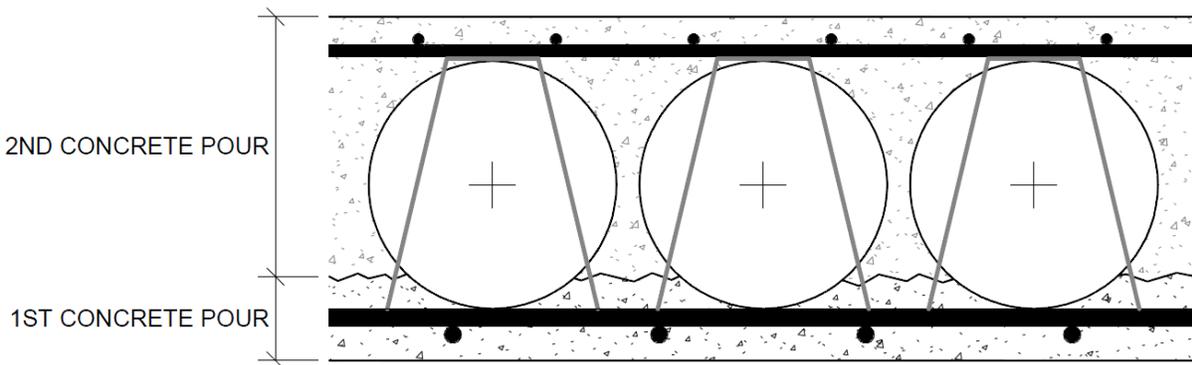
Cobiax Cast-in-Place Voided Slab Section
